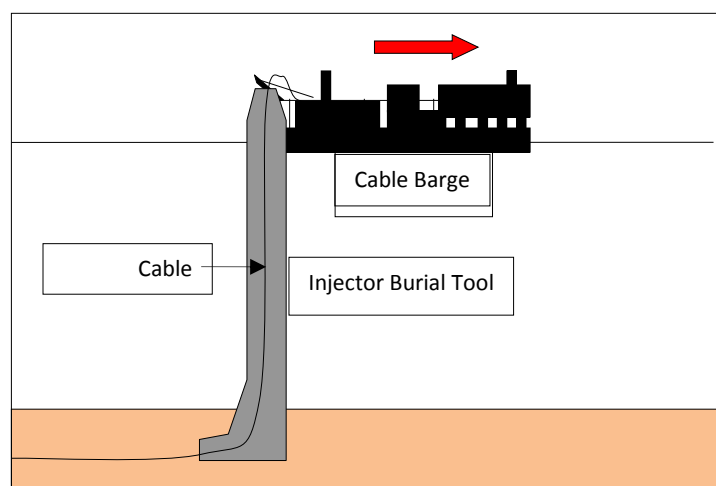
Examples of Cable-laying Vessels and Cable Burial Tools
